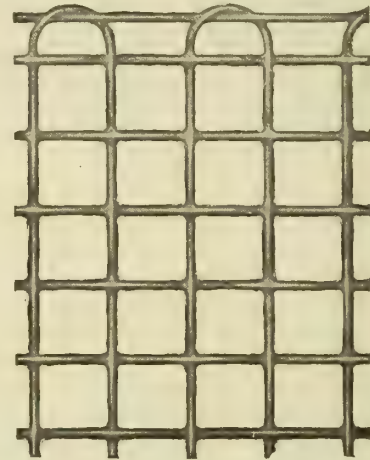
WRIGHT WIRE LATHING, GALVANIZED FINISH
